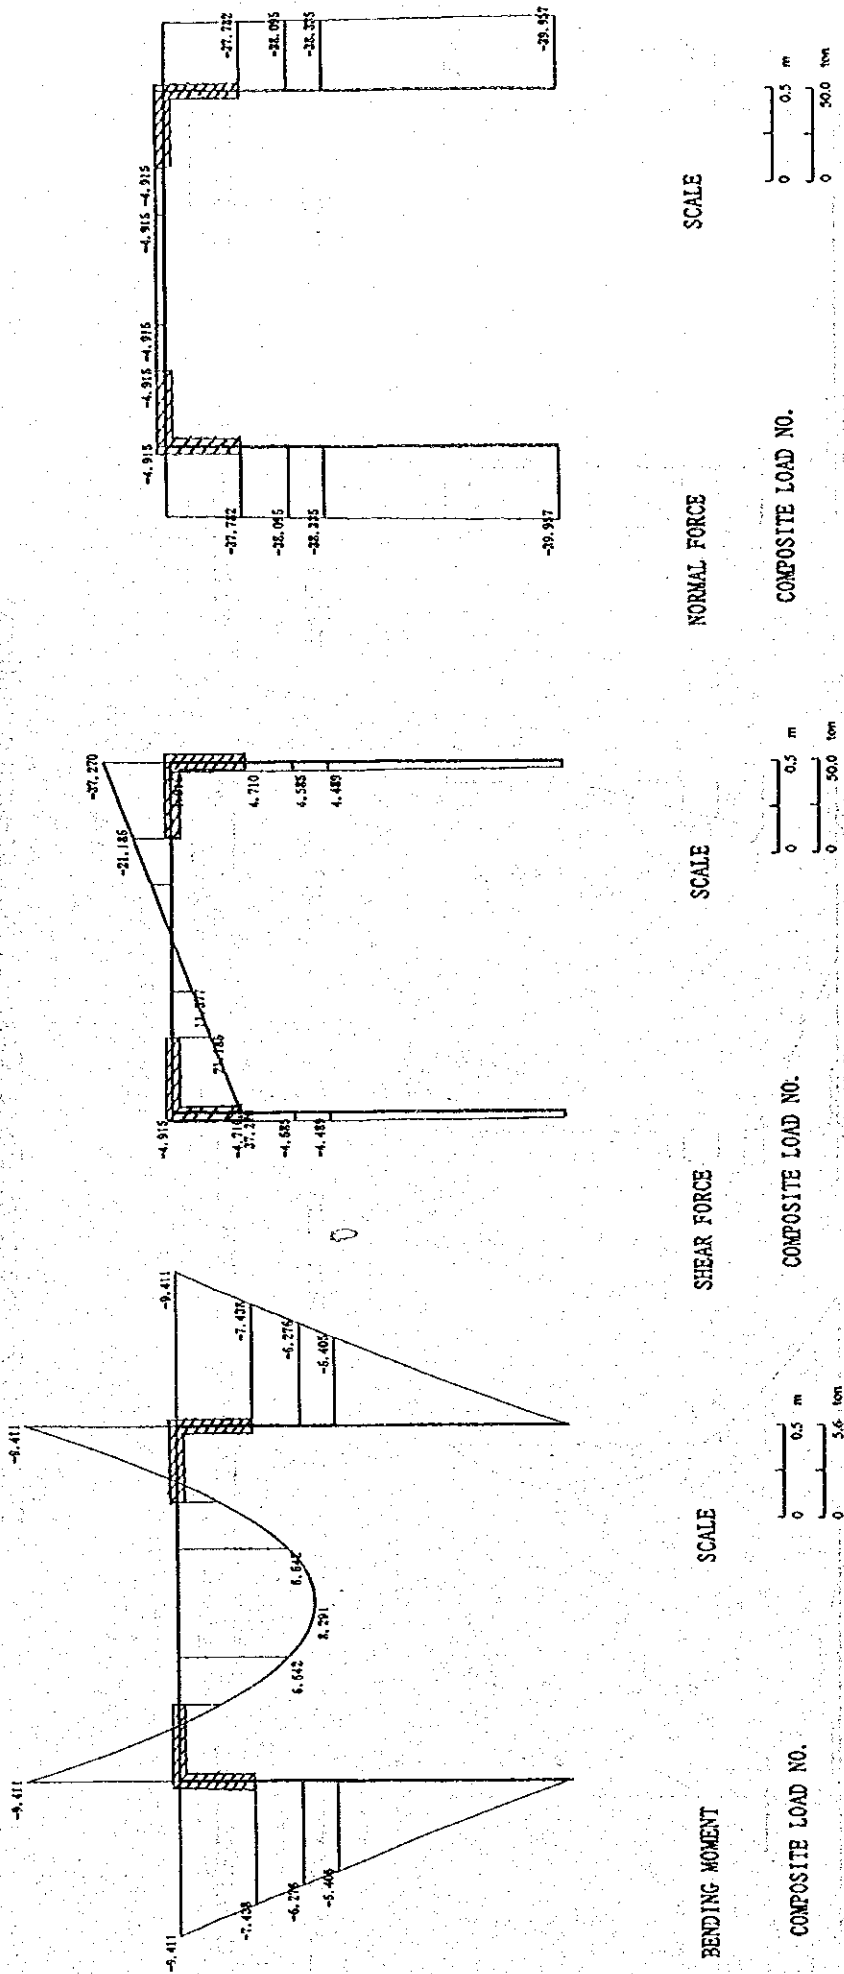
(2/2) Sectional Force (Case-B : when embankment is completed)
